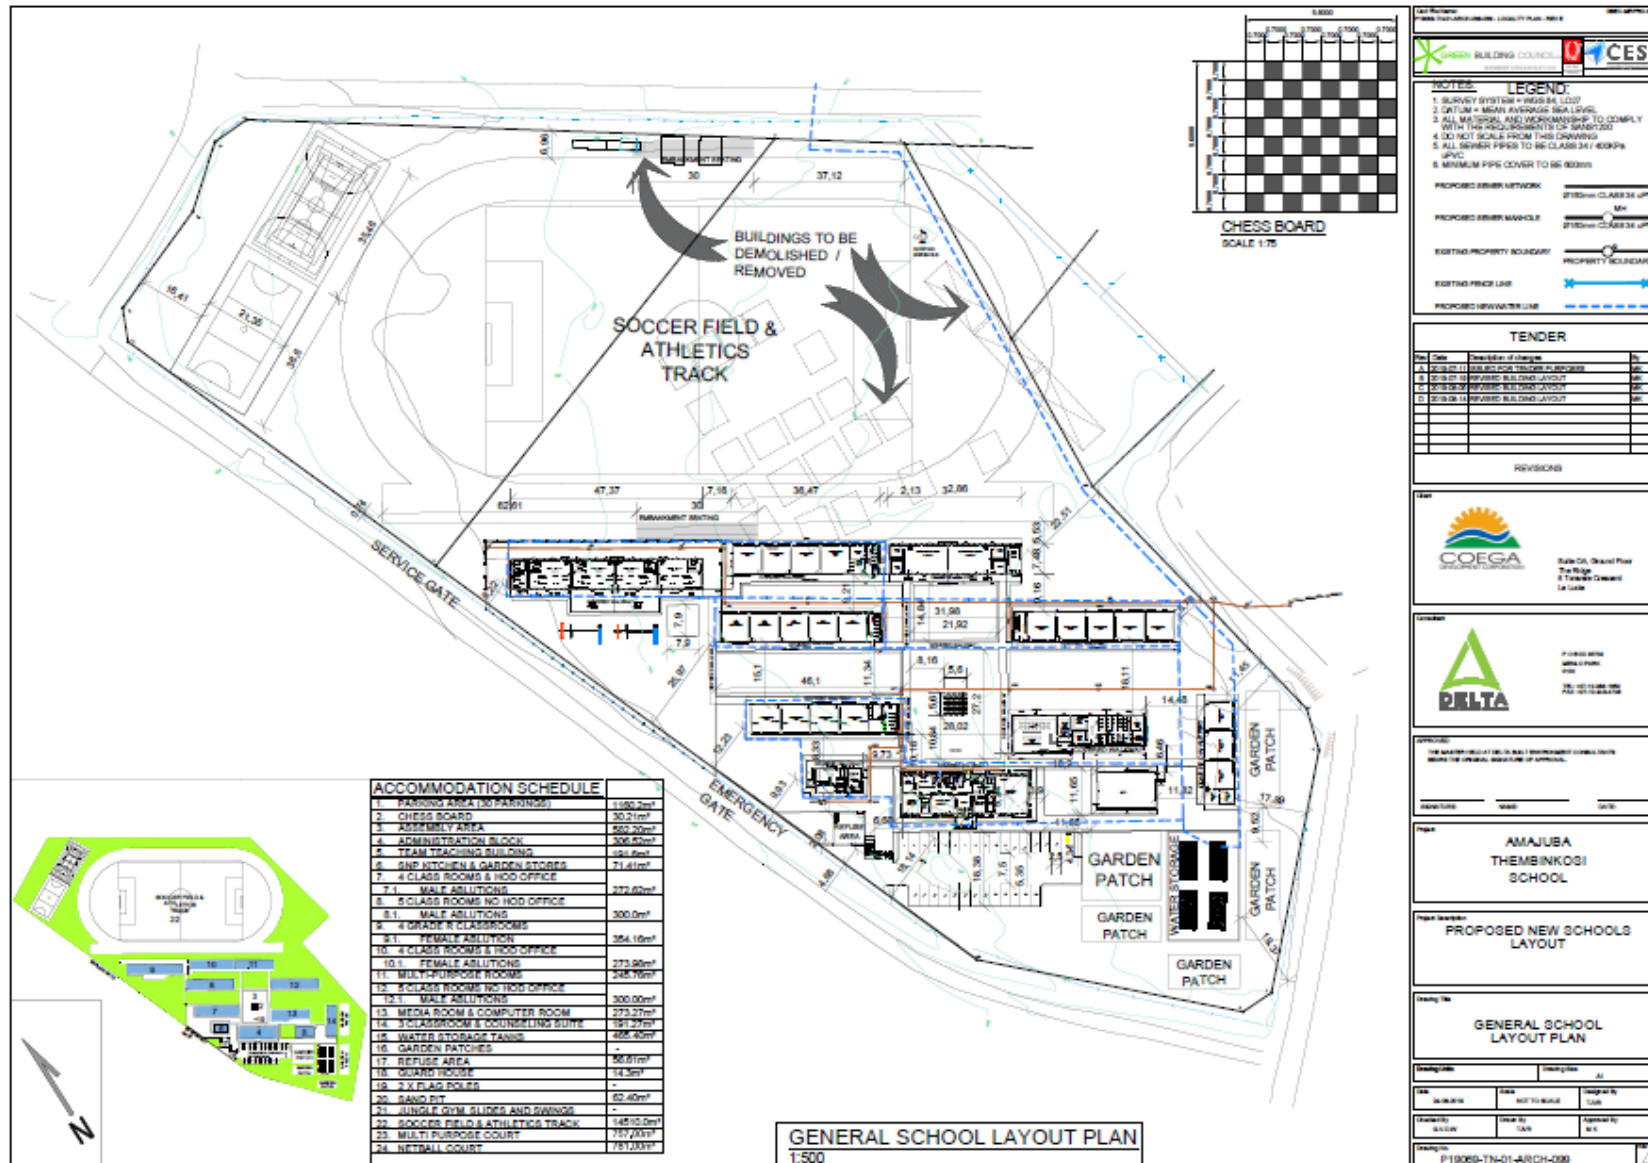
School layout plan on erf 803 and erf 804 (Source: DBEC, 2019).
